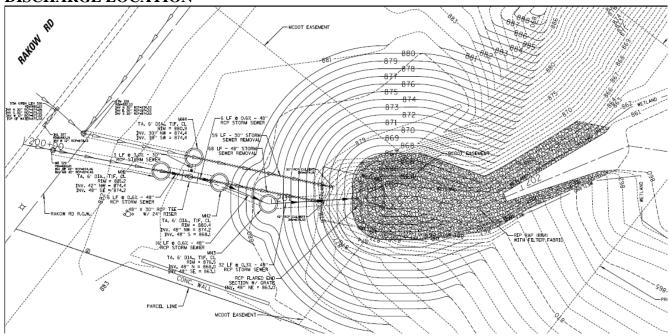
EXHIBIT B PLAN SKETCH General Depiction of the Improvements
